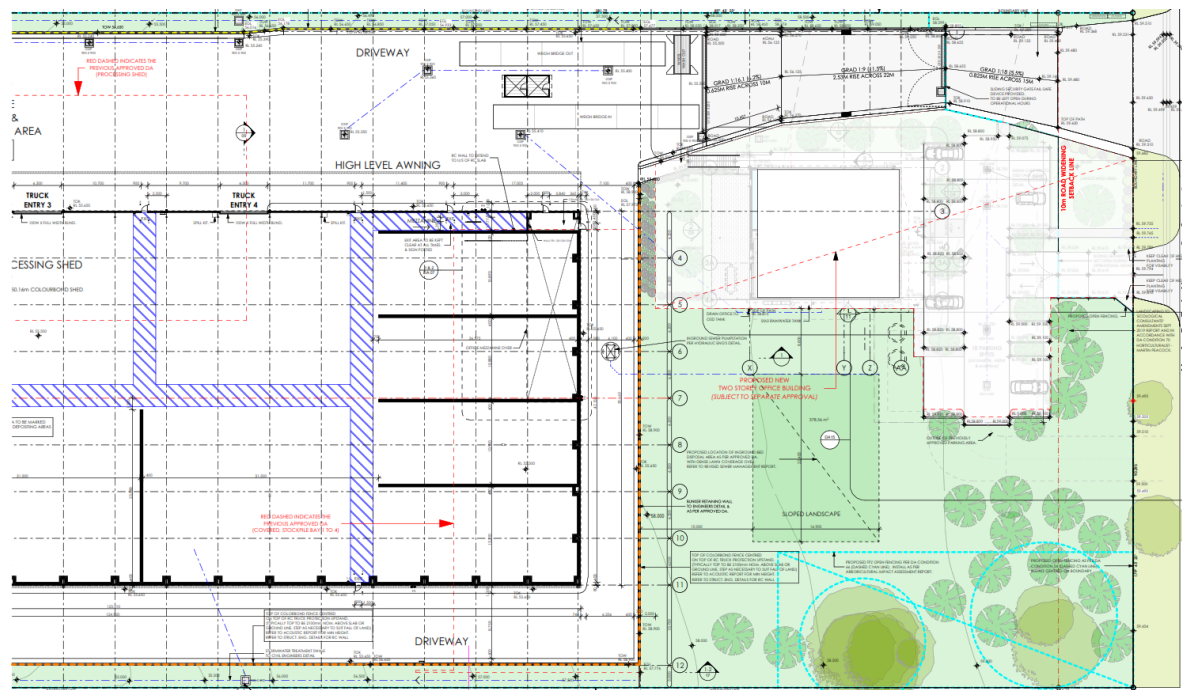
Proposed new 2 story office building. Source PTi Architecture (sheet DA04B) May 2025
